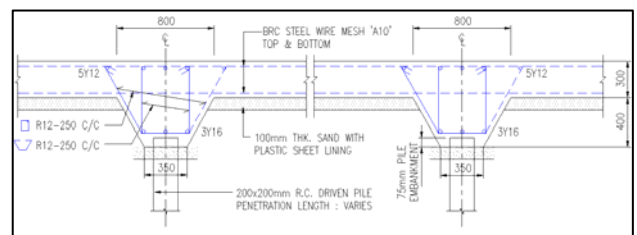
Typical cross-section of strip raft foundation system for low cost apartments (Tan, et al. 2005).
